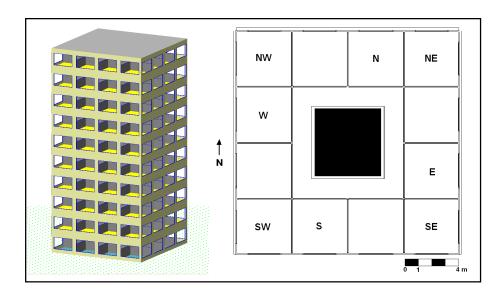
Detail of 3D model and plan view of the building used in the research.
